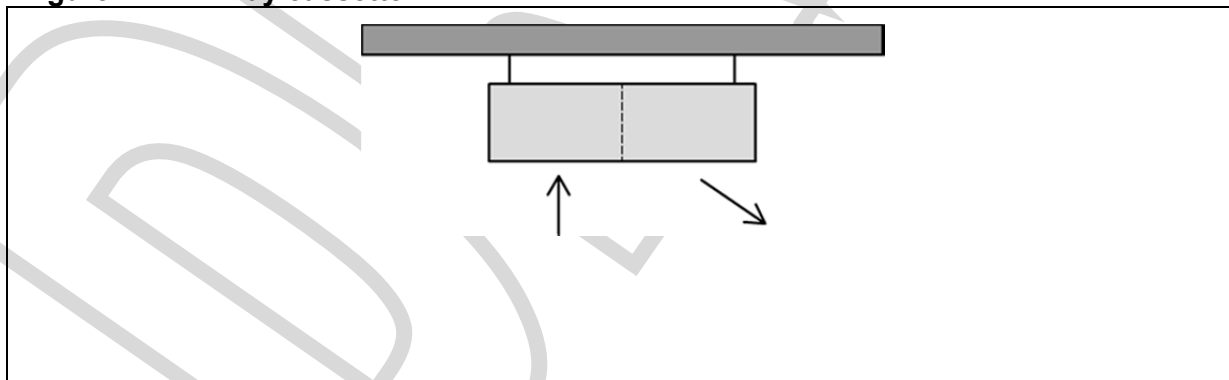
Under ceiling mounted I-Type (with/without casing/false ceiling)
